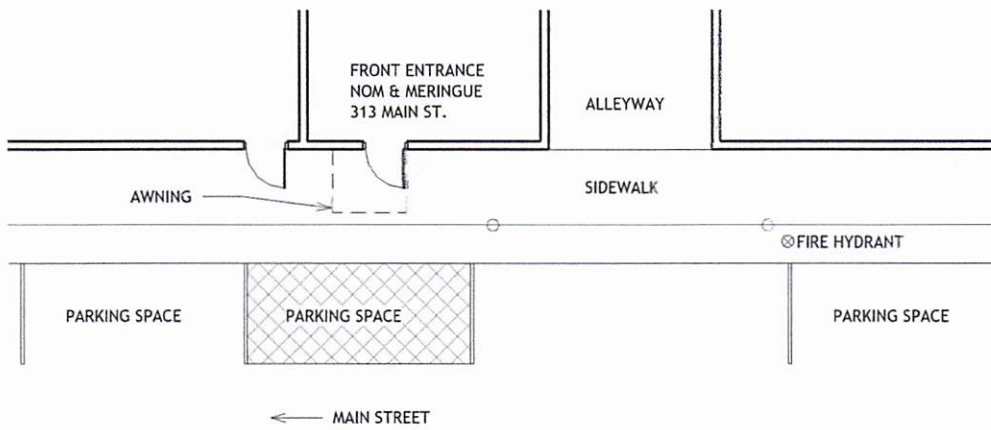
Plan View: Current Sidewalk, Parking and Alleyway 313 Main St.
